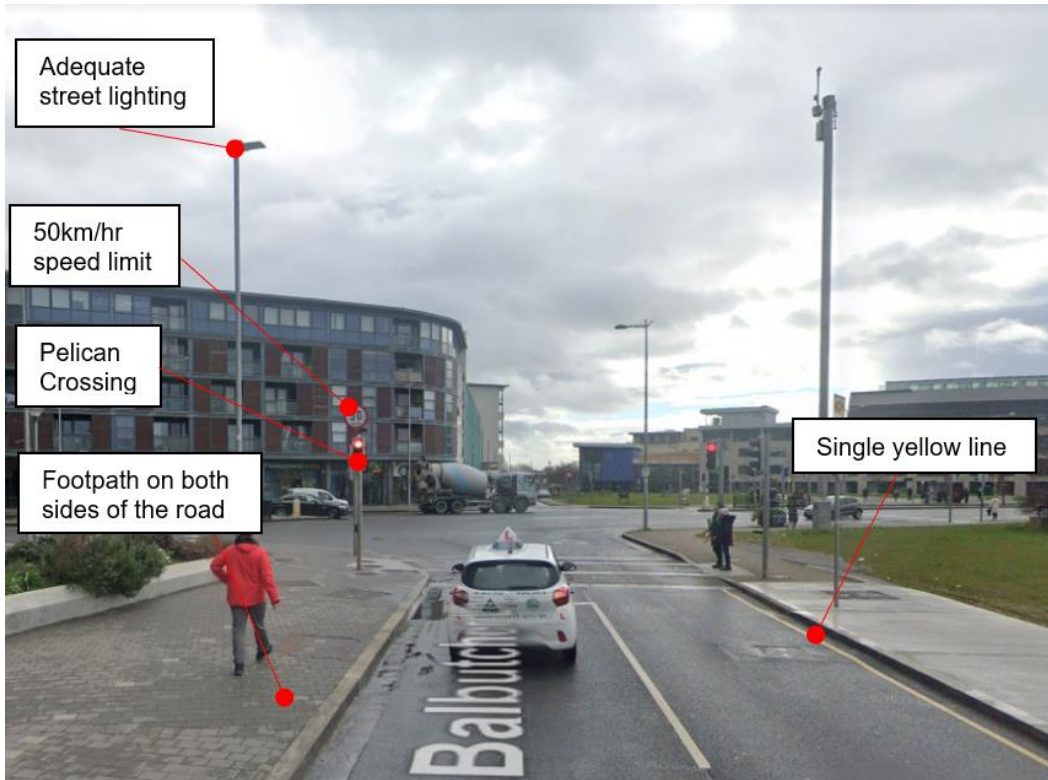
Balbutcher Lane (South of the site) Street View towards Ballymun Road
